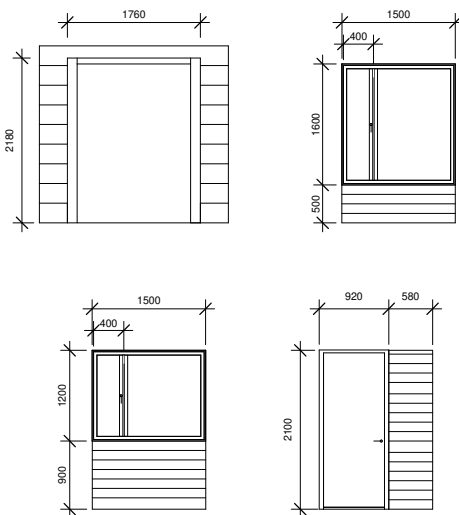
The cut out options: a opening, 1500x1600 mm window, 1500x1200 mm window and a door, 1:100
